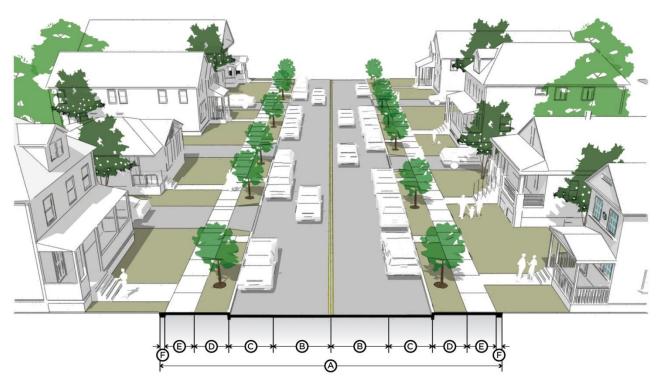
MINOR STREET: NEIGHBORHOOD YIELD STREET
